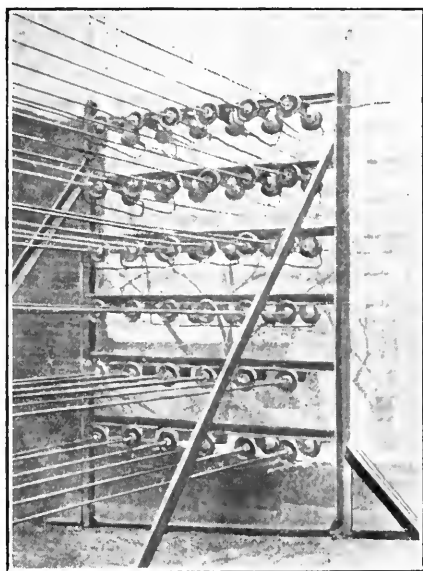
ROOF TERMINAL STRUCTURE FOR OUTGOING CIRCUITS
